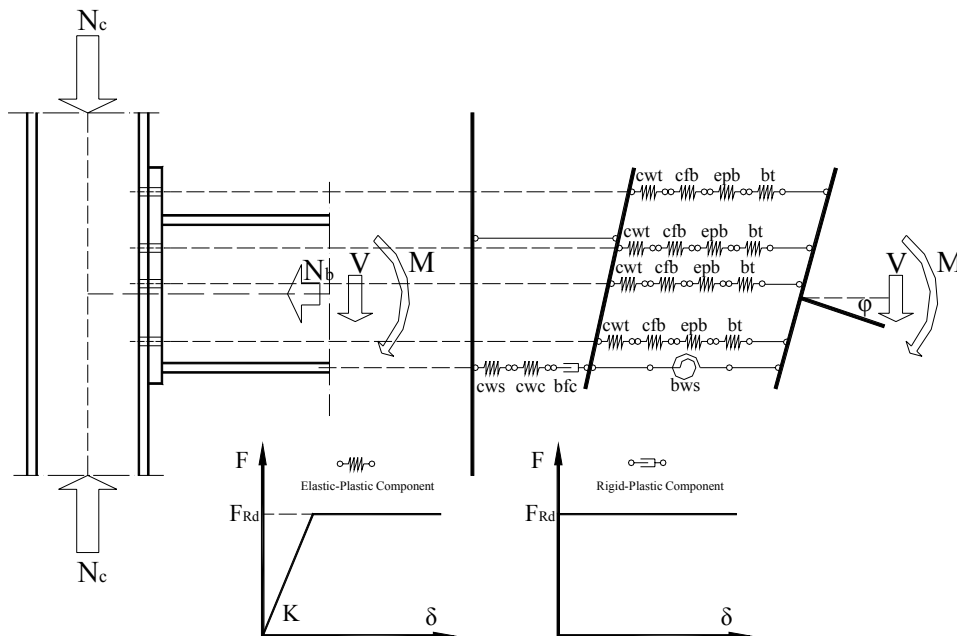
Steel Beam-to-Column End-plate Joint Spring Model
